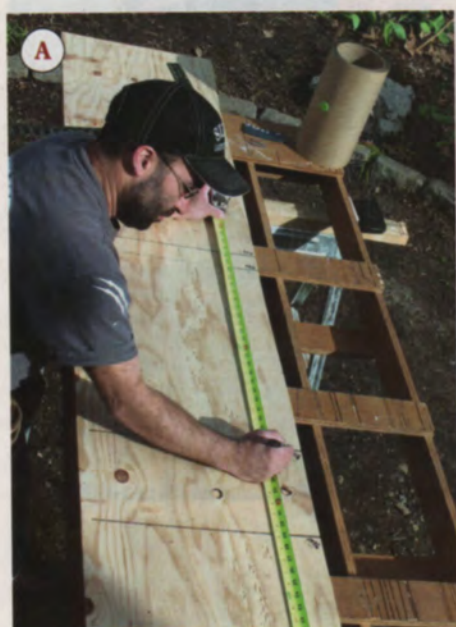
Transferring the dimensions of the flashing pieces to a plywood story board makes it easier to cut them accurately to length (A). Each piece is then folded lengthwise twice (B) so it's short enough to cut against a standard framing square (C). Corner pieces, or bow ties — measuring about 1½ inches by 8 inches overall — are cut from scrap material (D, E).
